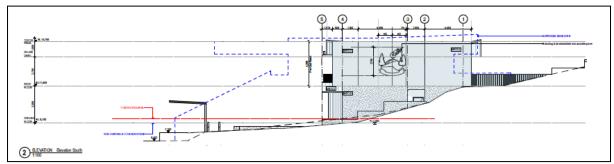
Proposed south elevation under DA-1321/2021/A which show the outline of the approved built form (in blue dotted line).
